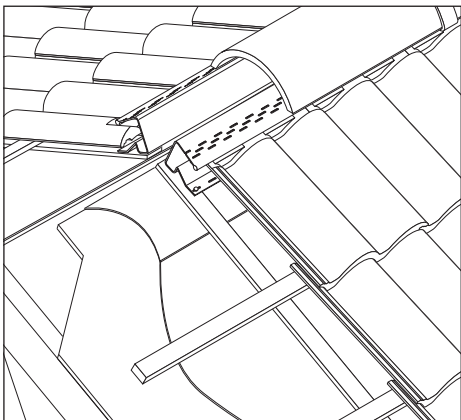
Battens and counter battens at ridge above rigid boarding and underlay (cut back at apex), (with Marley Eternit ventilated dry ridge system)
